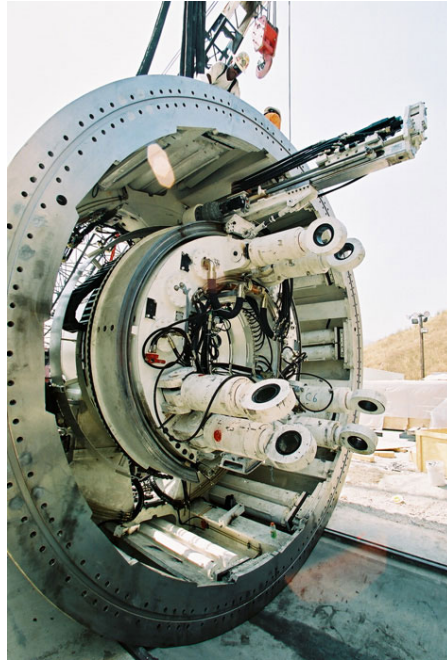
Drive unit with its forward grout/probe drill in assembly [18].
